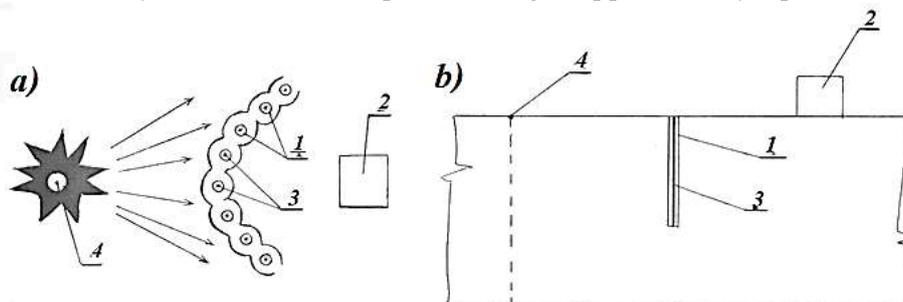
Schematic of object protection using a dynamic screen: a) plan view; b) longitudinal section
